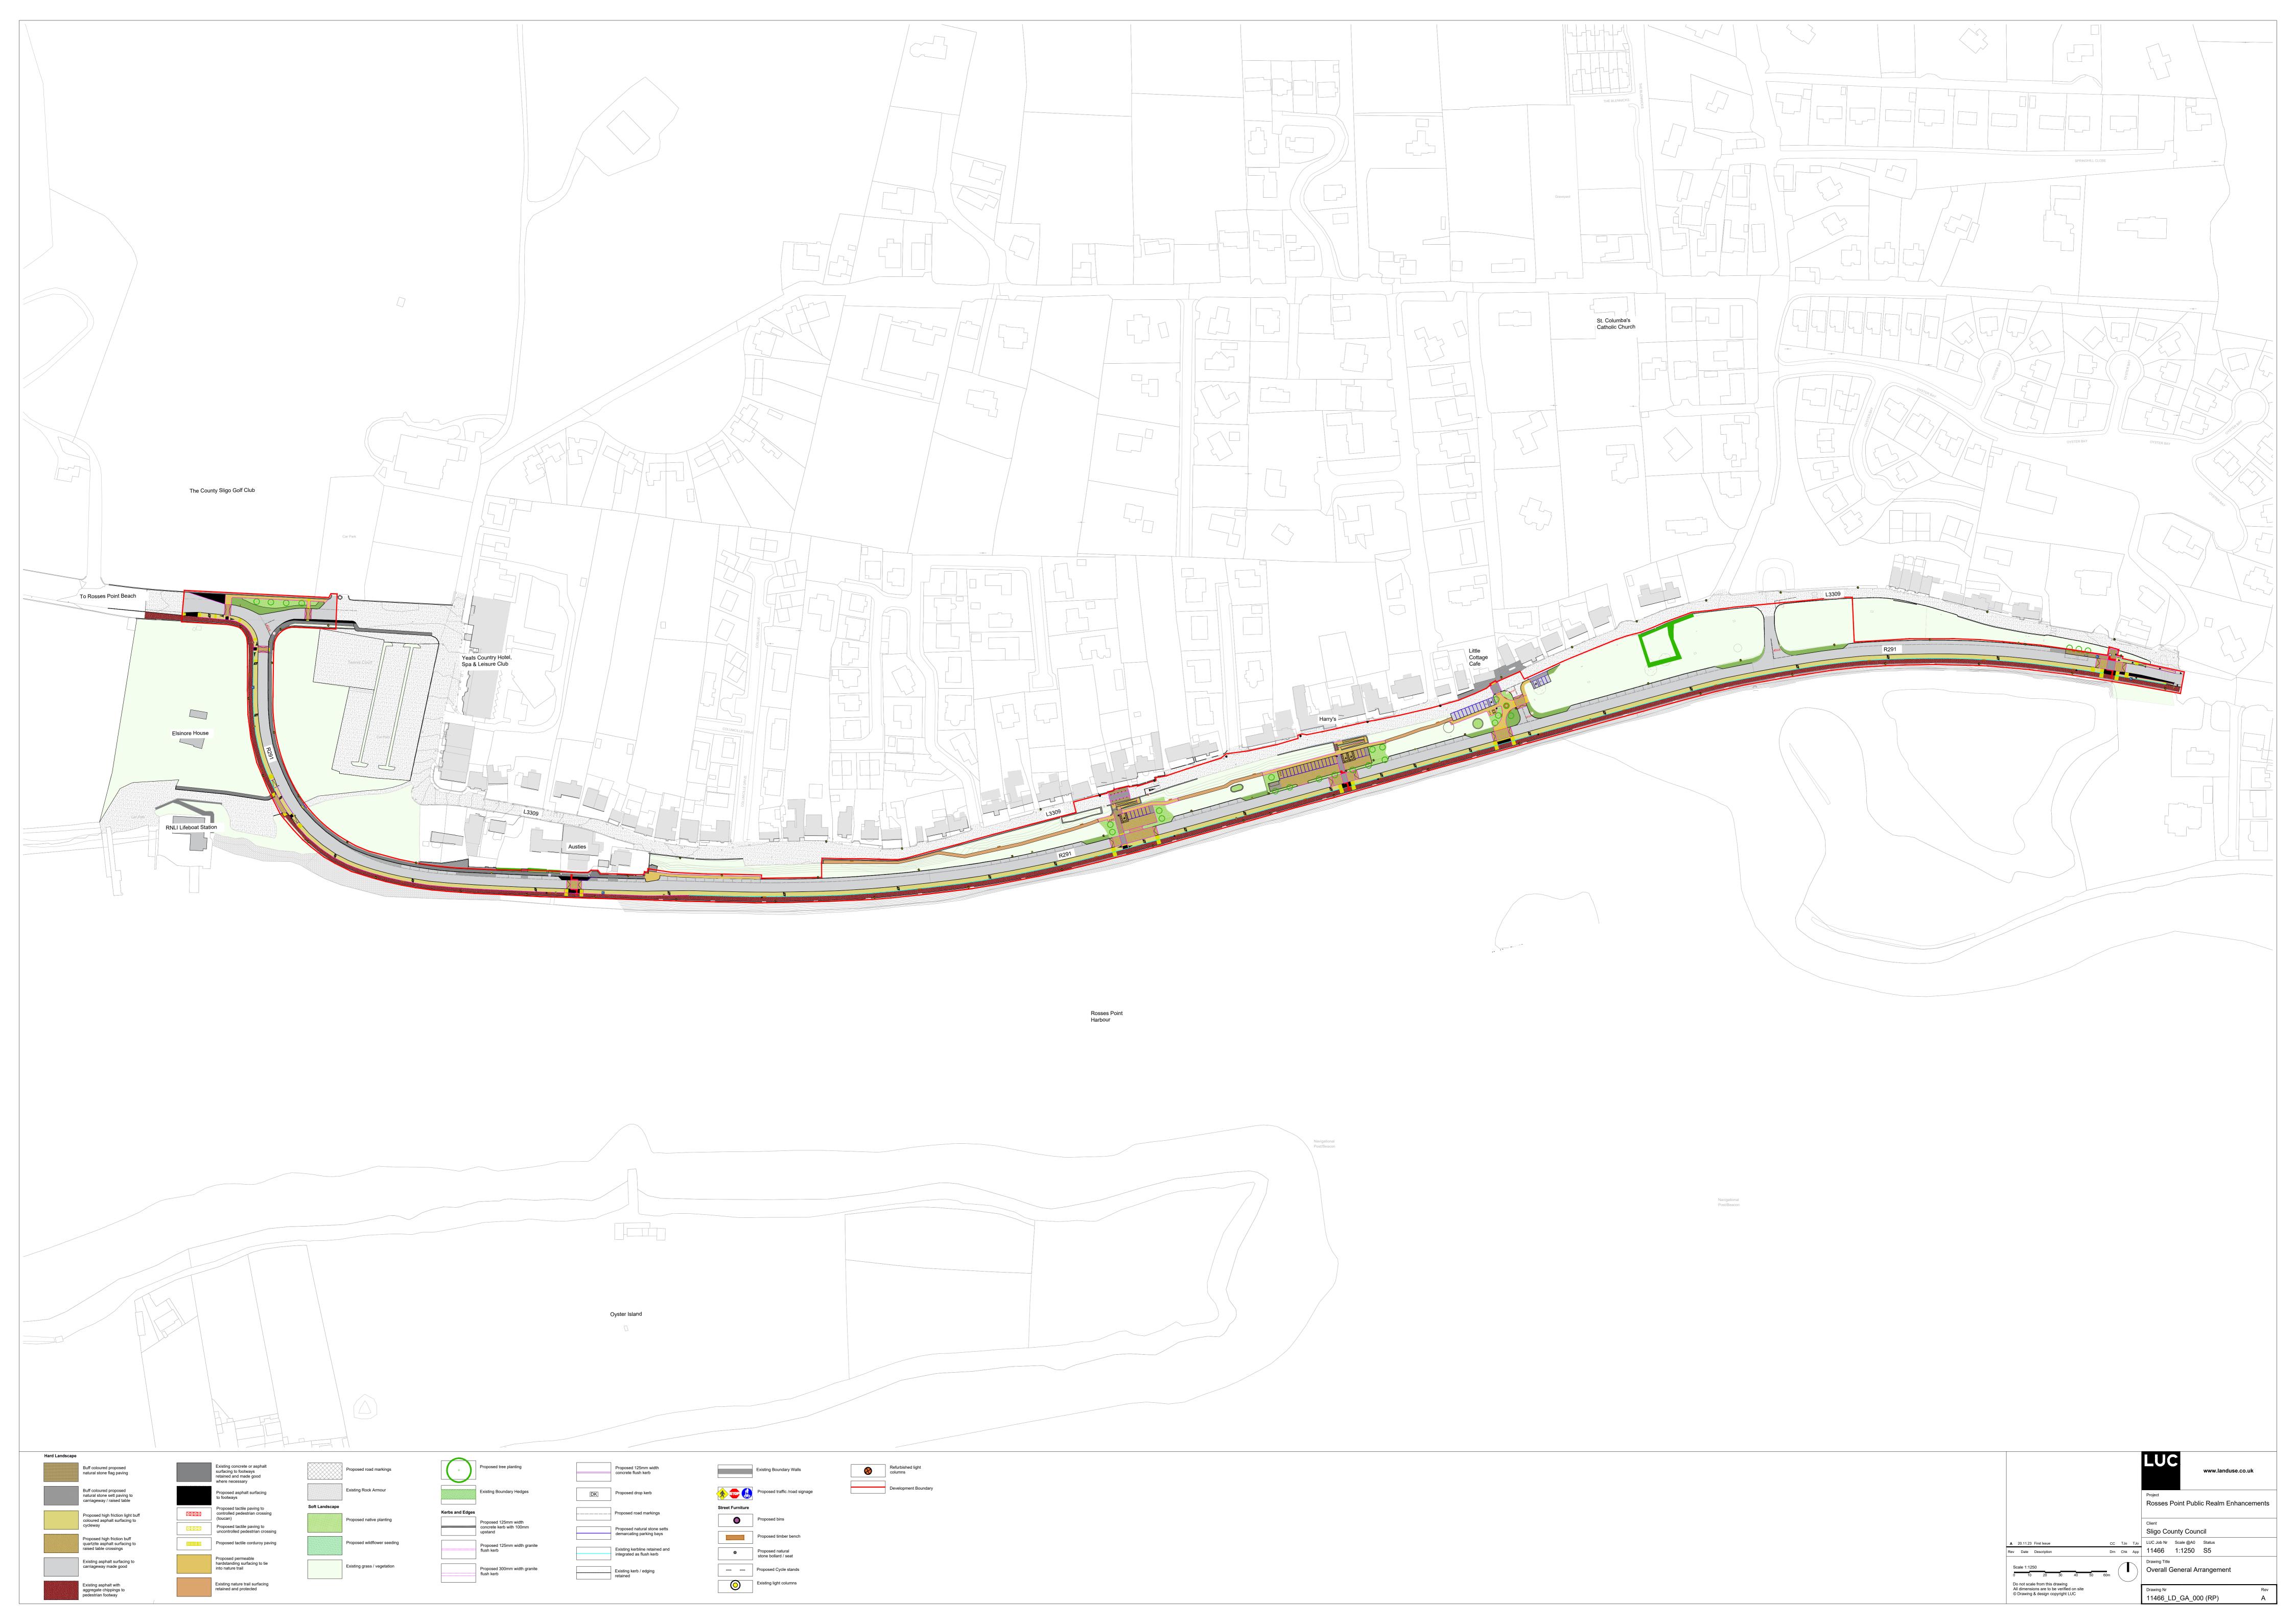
Location of raised table crossings, pedestrian access improvements and planting outside little cottage cafe
